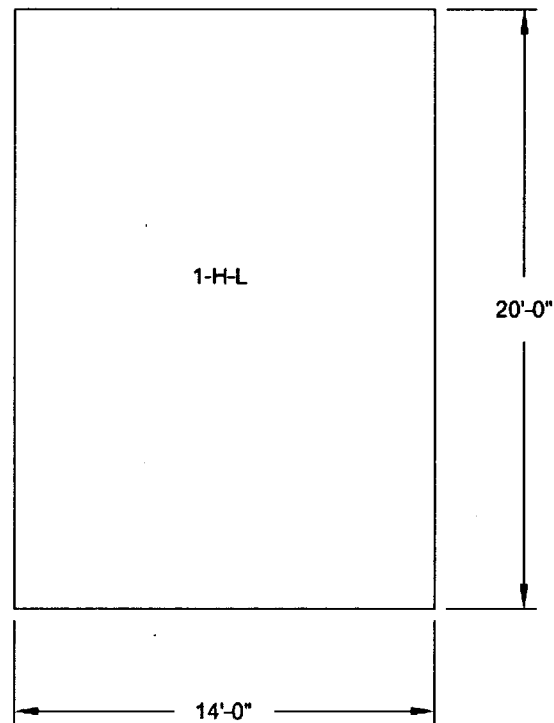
H.6-176 Wall 9 Looking From Outside
